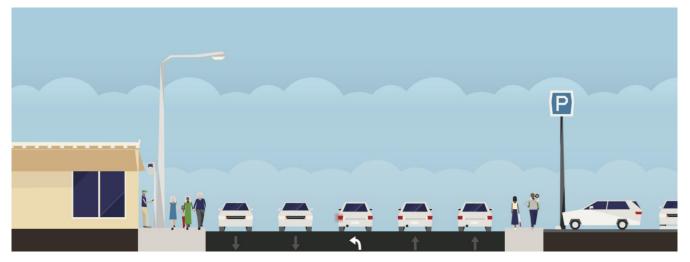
Stony Plain Road Facing East (West of 163 Street)
